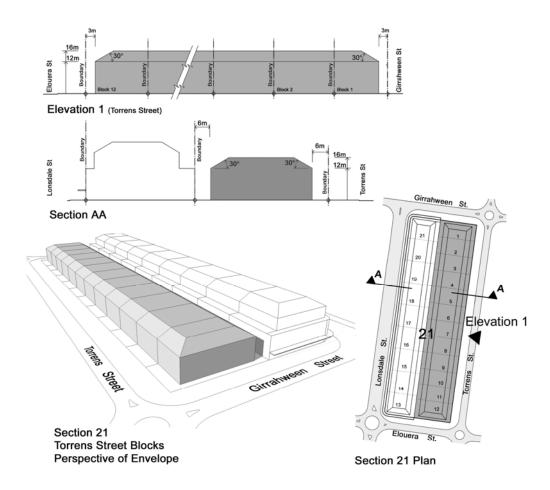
Building Envelope Diagram - Braddon section 21 blocks 1-12
